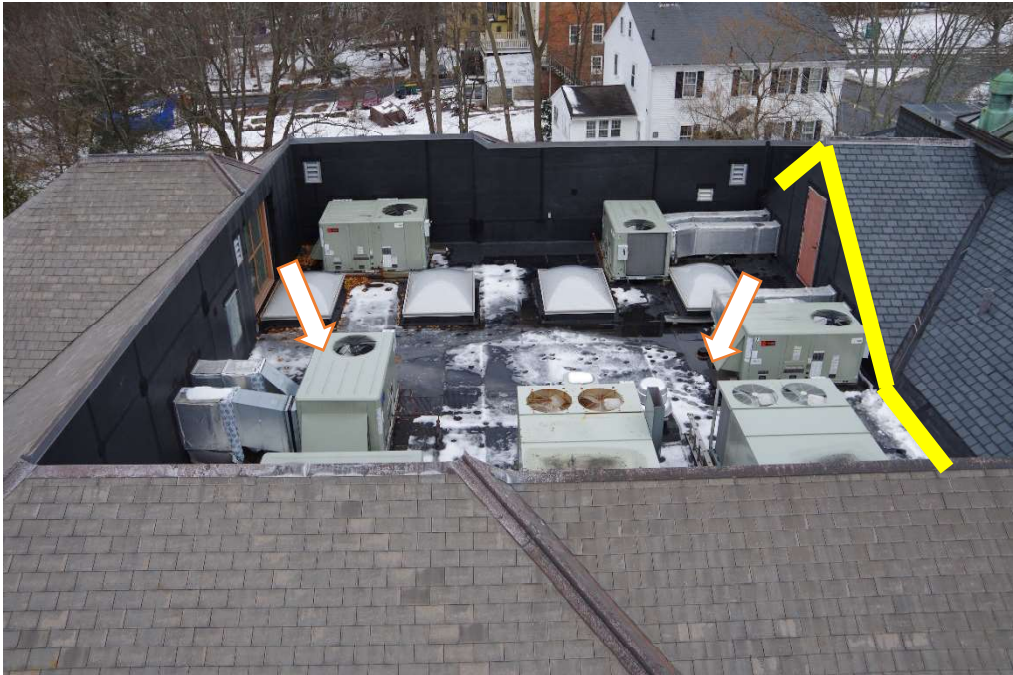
Overall view of low-slope, single-ply elastomeric roof system, which includes a 60 mil, fully-adhered membrane. The yellow line indicates the approximate location of roof and wall expansion joint (abutment of original 1893 building and 1999 addition). Arrows indicate the approximate location of roof drains. Most of the library's HVAC equipment is installed here, therefore, it has the most roof penetrations of all the roof systems. Four large skylights are also located at this roof.
